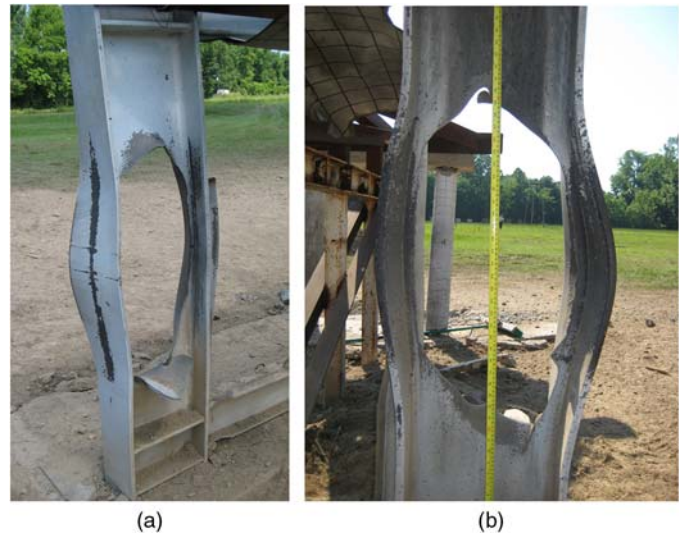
Photographs of Specimen 2R after Test 1: (a) isometric; (b) front
